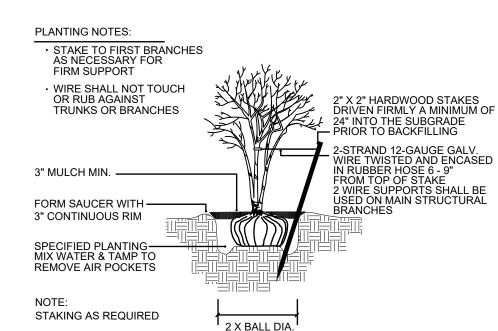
DETAILS: PLANTING PLANTING NOTES: • PLANT SO THAT TOP OF ROOT CANOPY SPREAD BALL IS EVEN/SLIGHTLY ABOVE FINISHED GRADE STAKE TO FIRST BRANCHES AS NECESSARY FOR FIRM SUPPORT STAKING WIRE SHALL NOT TOUCH OR RUB ADJACENT TRUNKS OR BRANCHES DRÍVEN FIRMLY A MINIMUM OF 24" INTO THE SUBGRADE PRIOR TO BACKFILLING 2-STRAND 12-GAUGE GALV.-TREE WRAP WIRE TWISTED AND ENCASED -3" MULCH MIN FROM TOP OF STAKE 2 WIRE SUPPORTS SHALL BE USED FORM SAUCER N MAIN STRUCTURAL BRANCHES SPECIFIED PLANTING MIX-NATER & TAMP TO REMOVE AIR POCKETS STAKING AND WRAPPING
